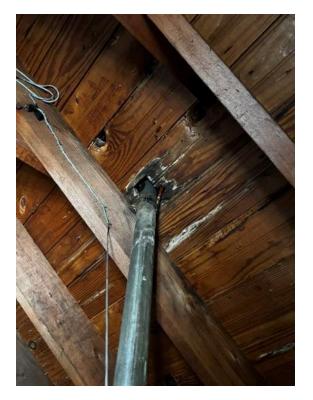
IMG_1576 – Roof Deck – Visible rot and moisture infiltration at roof deck surrounding plumbing vent stack indicating inadequate flashing.
